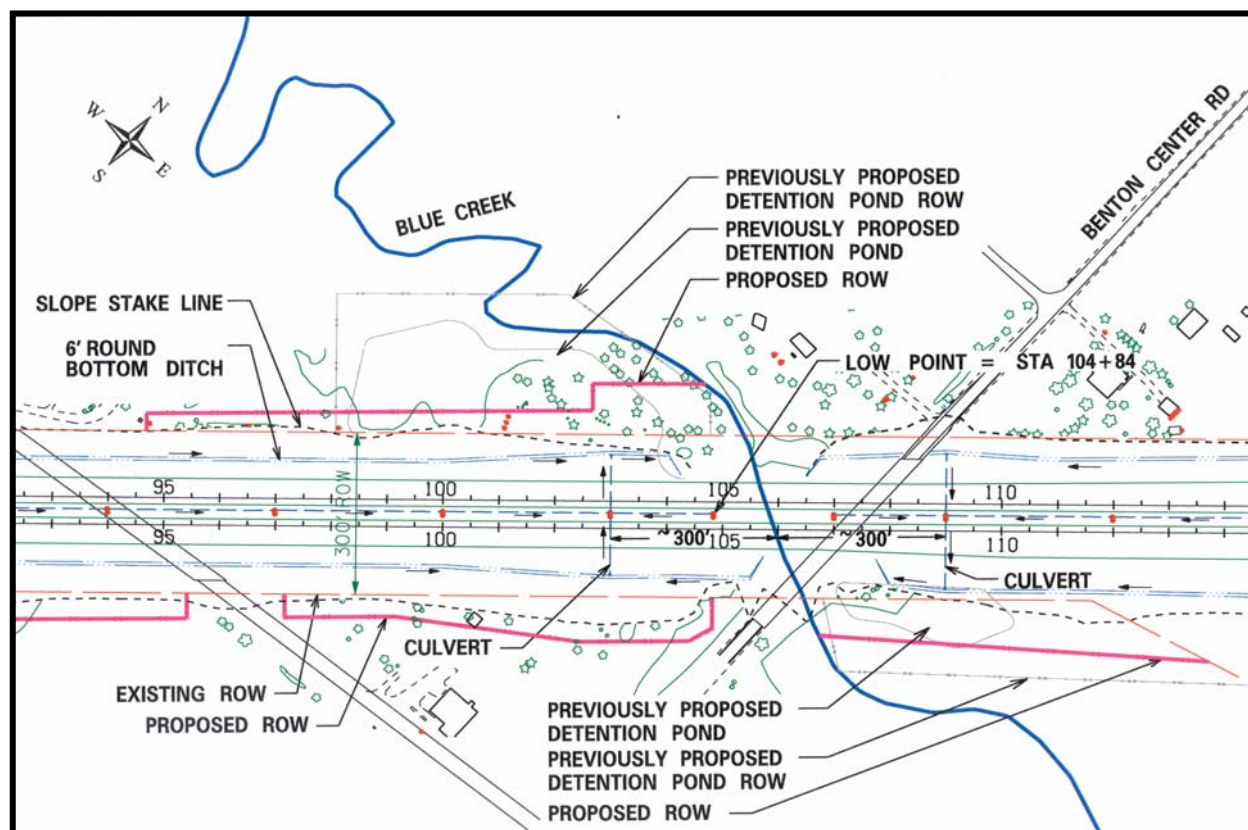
Recommended Alternative PA-2 Drainage along I-94
